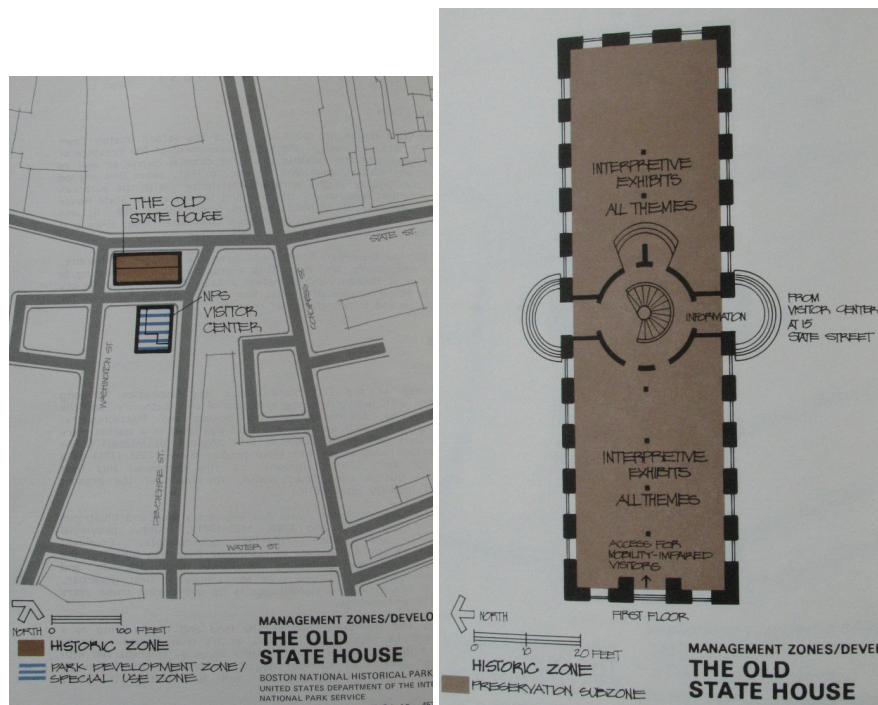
Site plan and the first floor plan of the Old State House (General Management Plan 1980) pp. 101-104
